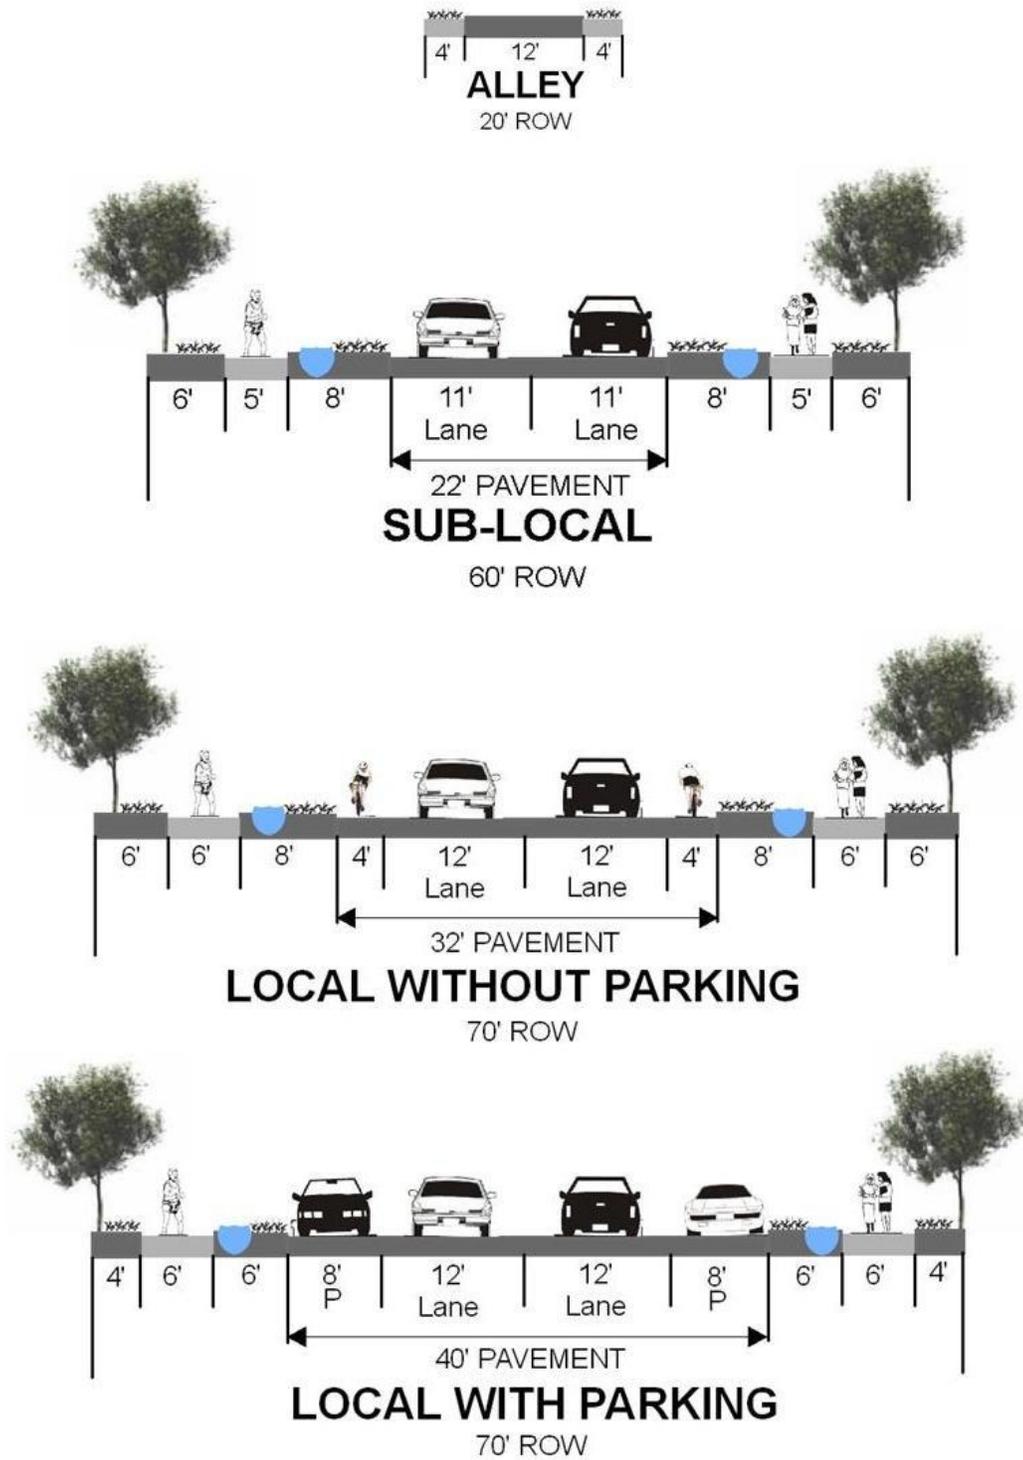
ROAD CONSTRUCTION STANDARDS
